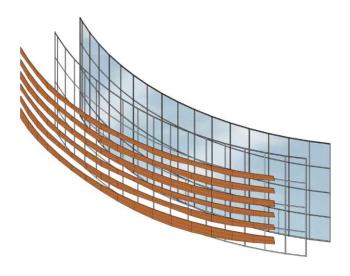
3 Layers of the Glass Facades: Curtain Wall, substructure that carry the panels and corten panels
